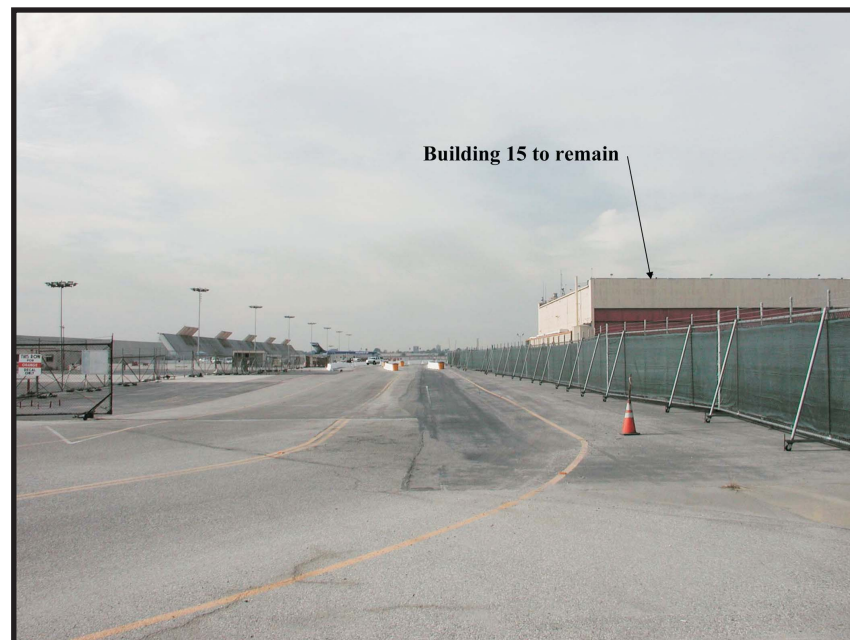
Looking southwest from the central portion of the site at the Enclave.
